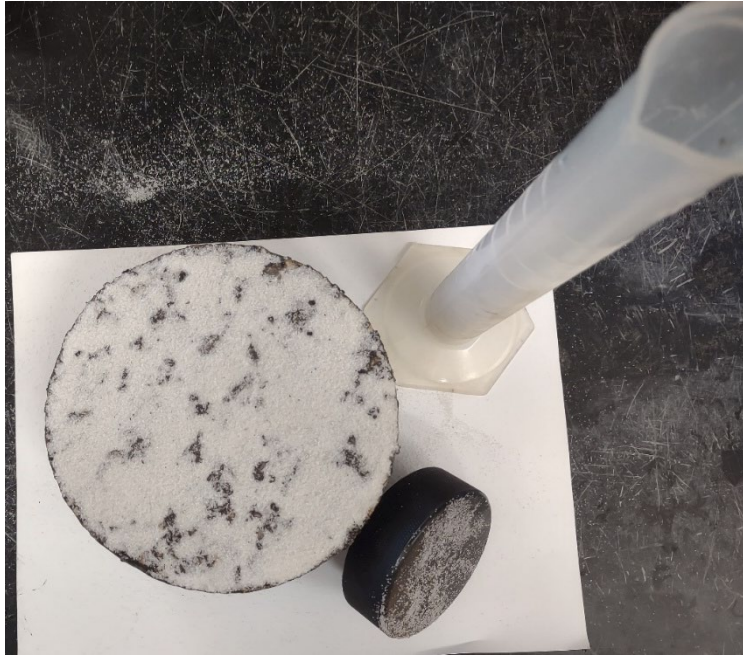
Determination of Macrotexture Depth of Milled Surface Using the Sand Patch Test
